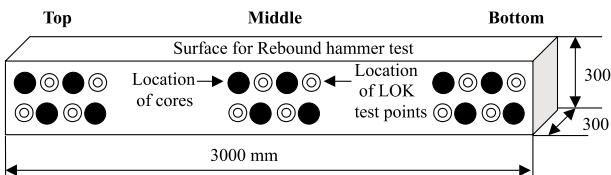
Schematic diagram showing the in situ test locations on a typical column.
